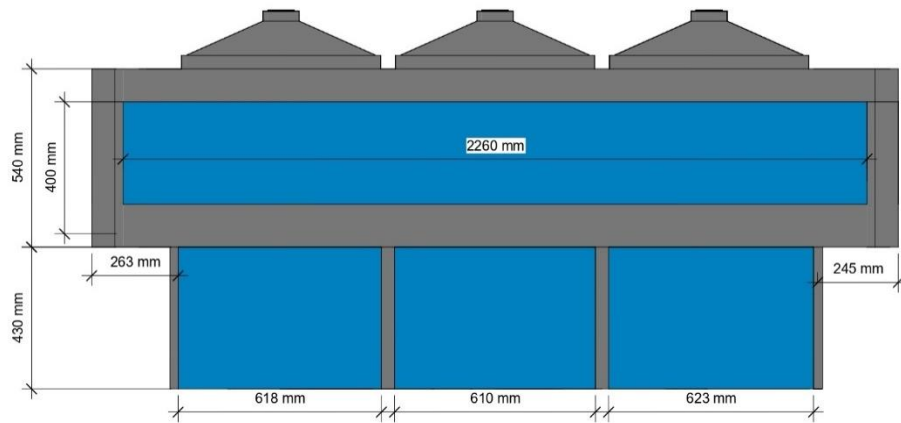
South facade drawing of the south section of METU Cafeteria Building
